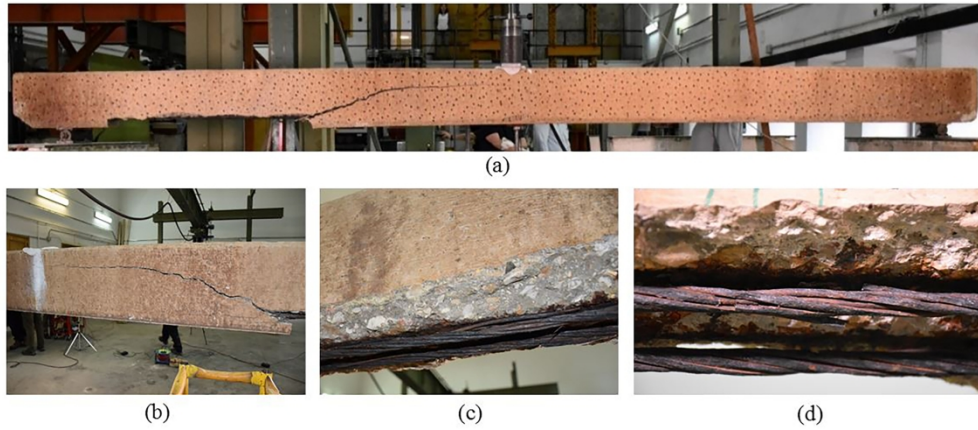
Viga 470 beam at failure: (a) front side, (b) detail of the crack in the back side, (c) and (d) details of corroded strands in correspondence of the concrete cover expulsion.
